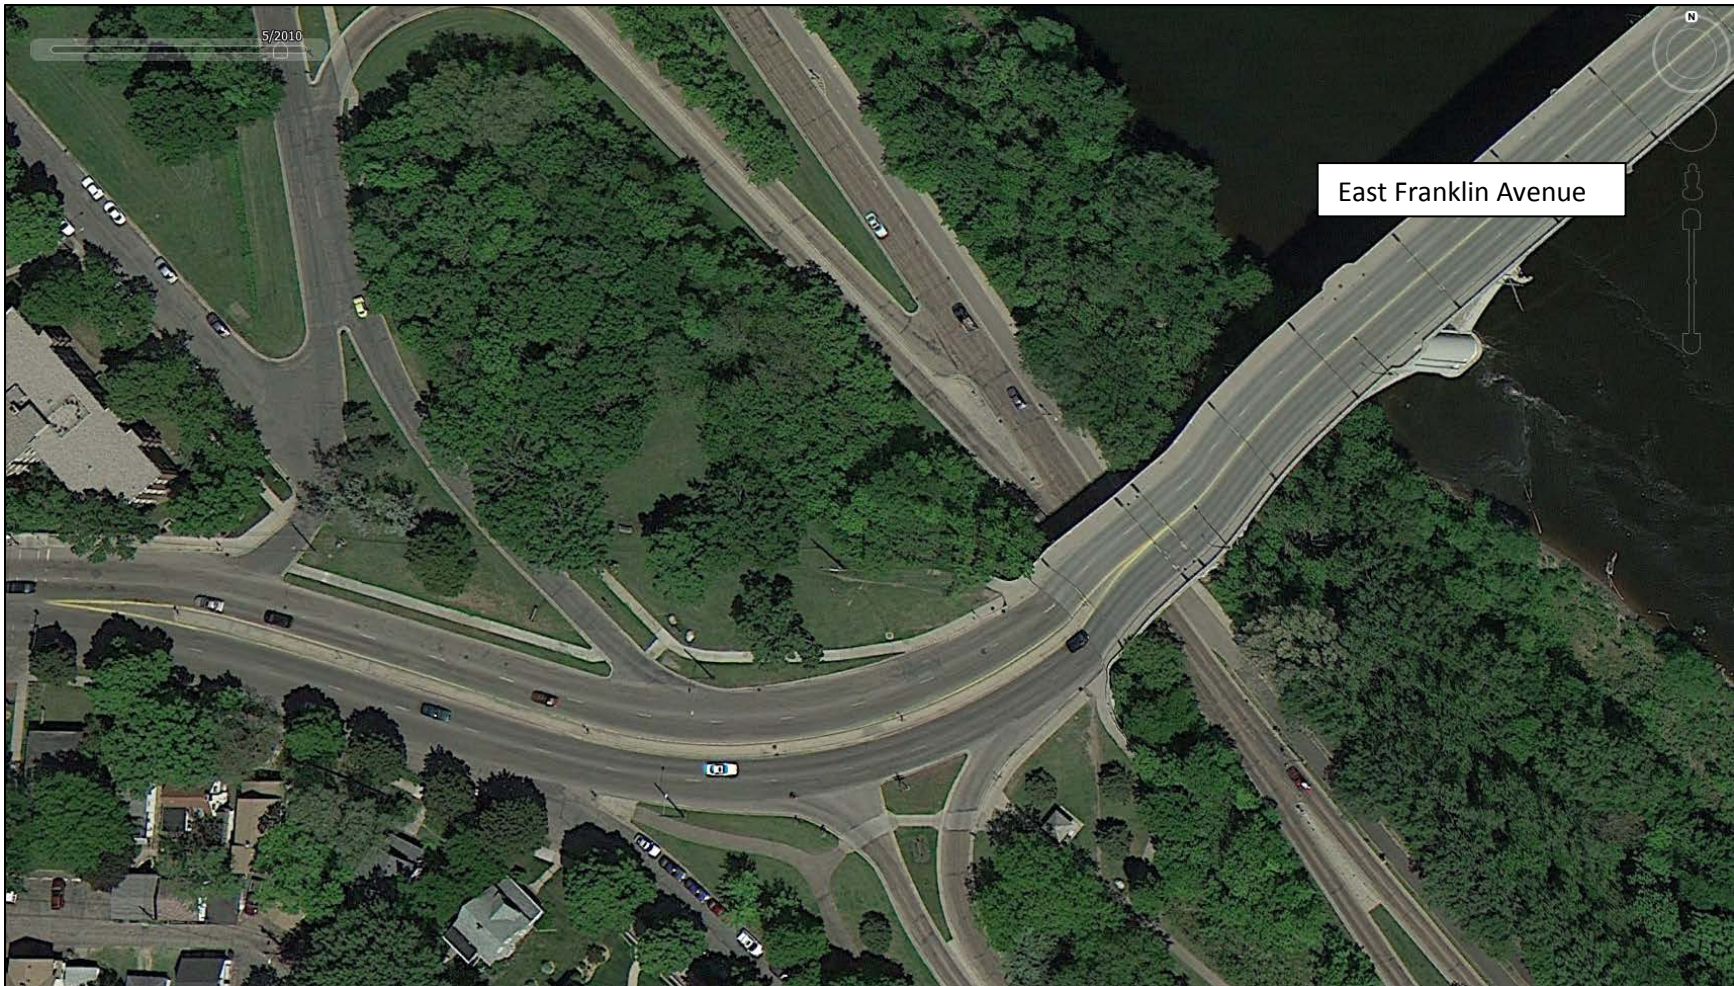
East Franklin Avenue Near Mississippi River Bridge Before Reconstruction Showing Four Travel Lanes
